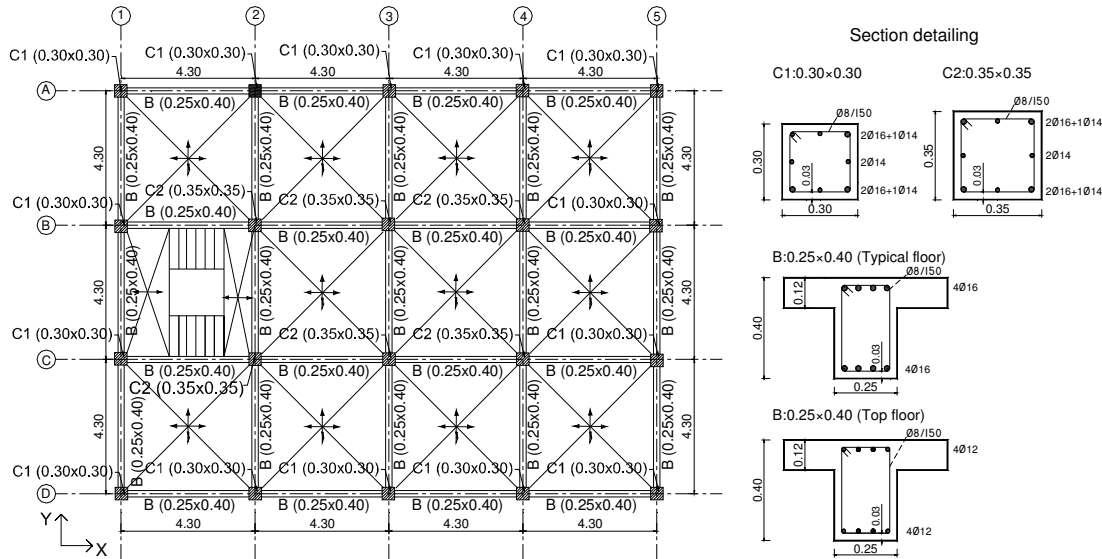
Plan view of a typical storey of the 3-storey, 4- storey and 5- storey buildings and the design details (all dimensions are in m).
